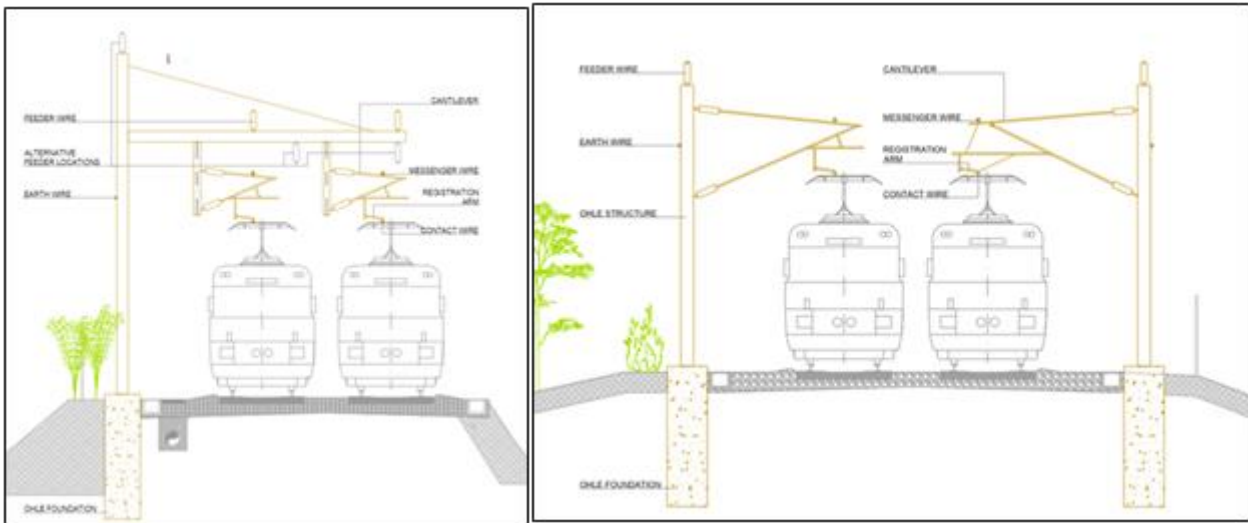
Typical OHLE arrangement in two track open route - Facing North
